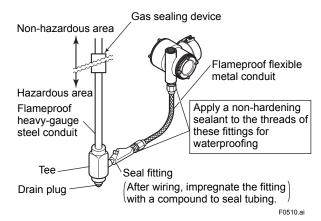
Typical Wiring Using Flameproof Metal Conduit
